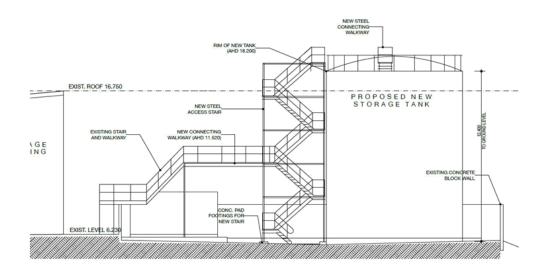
East elevation of proposed storage tank showing new connecting walkway and access stair (Source: James Gatley Architects)
